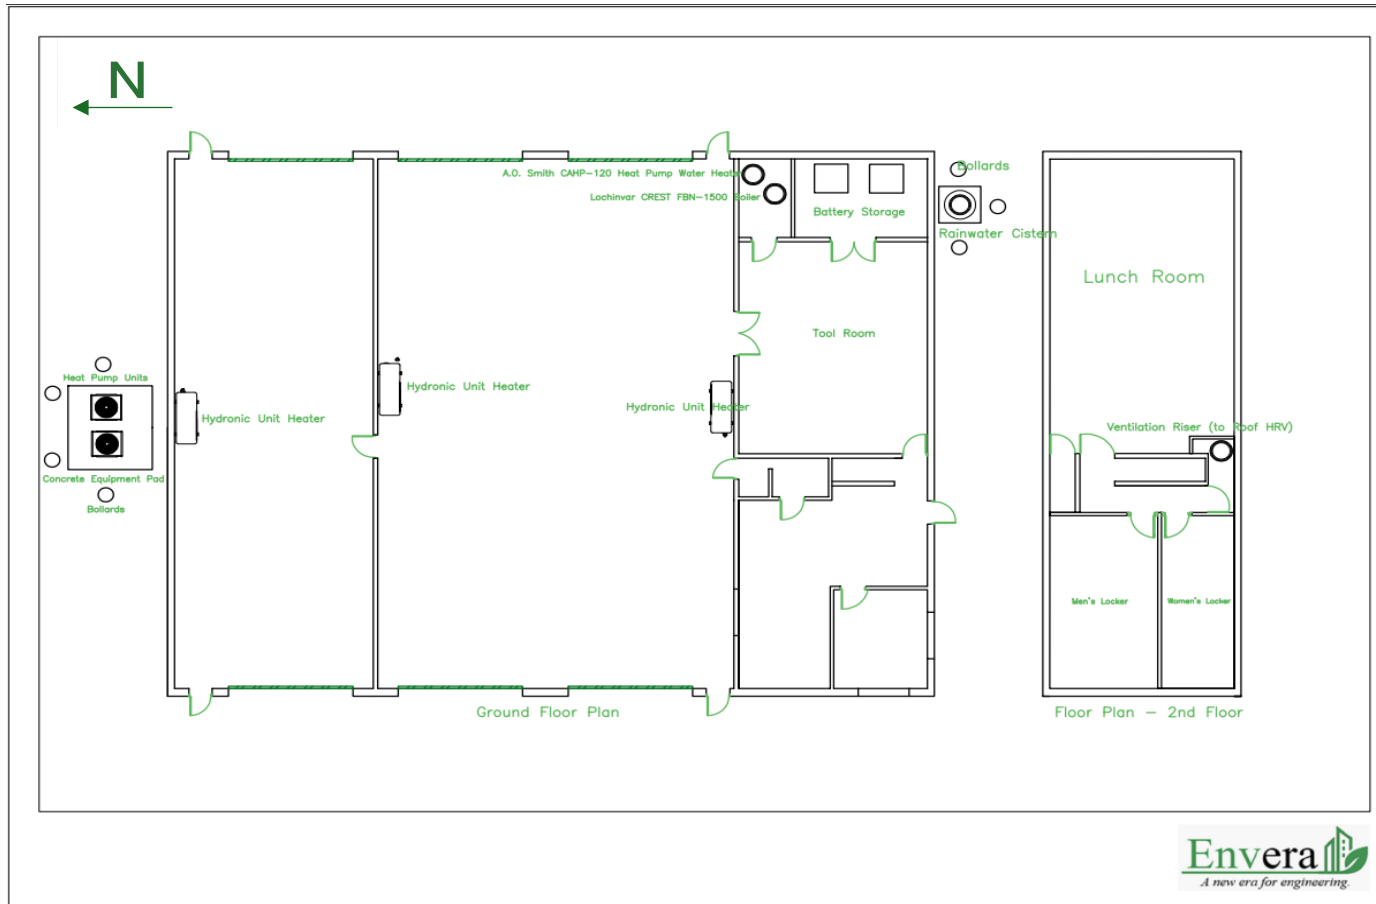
Plan showing exterior heat pumps, hydronic unit heaters in truck bays, mechanical room equipment, and HRV riser to rooftop ventilation unit. Office areas are conditioned by the heat pump system using existing ductwork.
